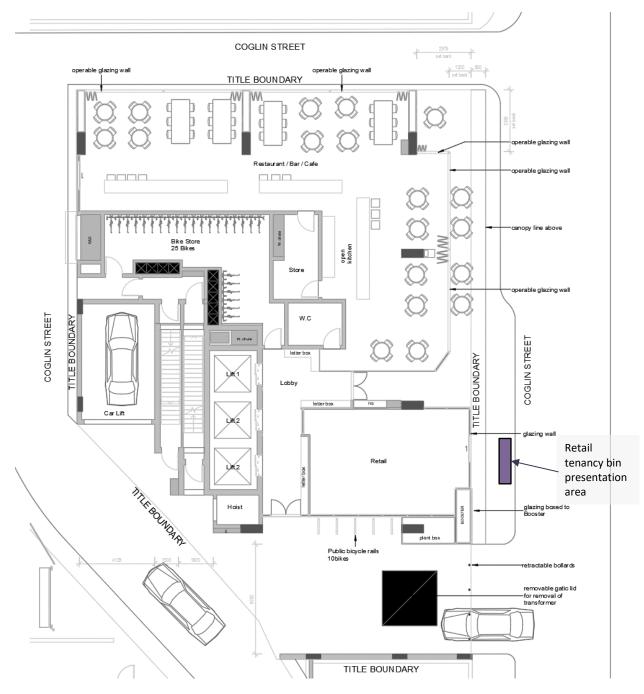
Ground floor plan showing retail tenancy bin presentation area
